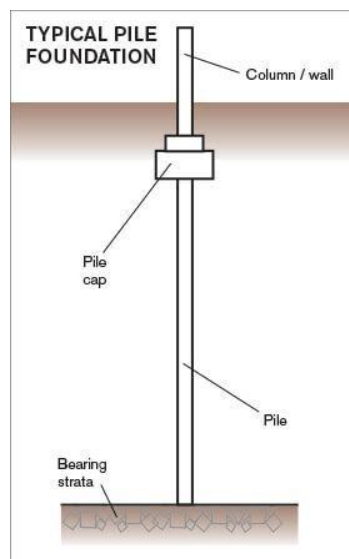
Typical pile foundation. (Bowels, 1996)
